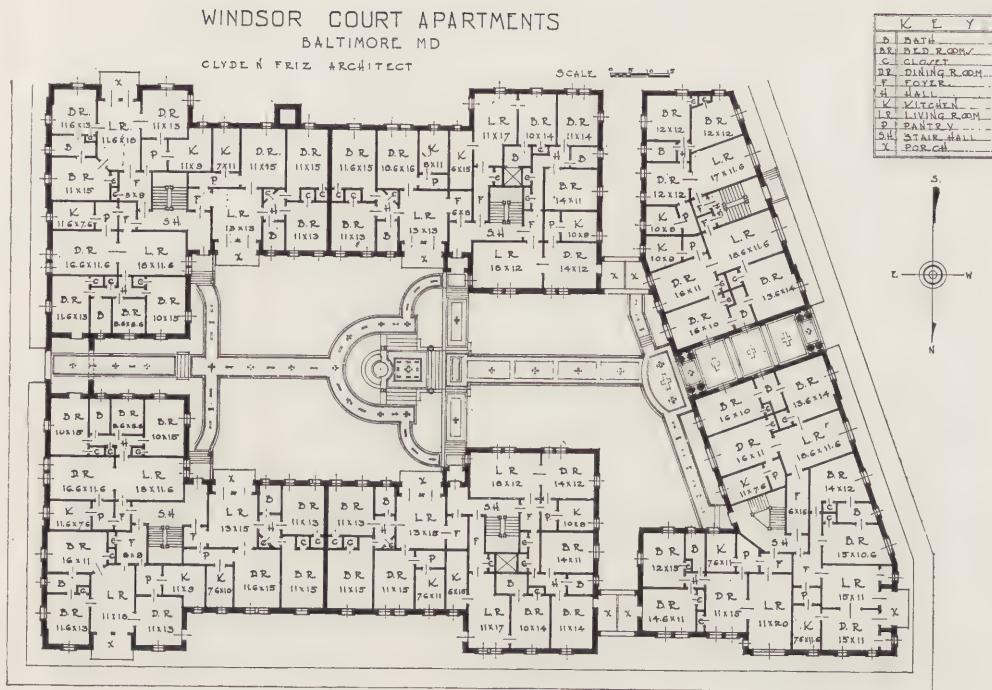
TYPICAL FLOOR PLAN OF WINDSOR COURT APARTMENTS.
